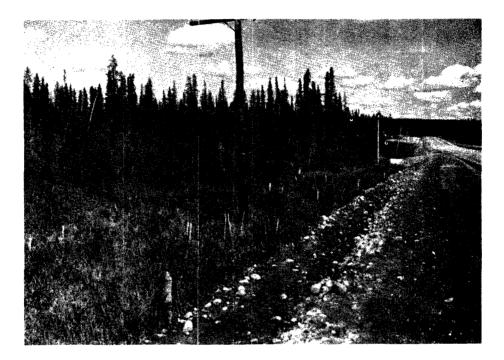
Wetland vegetation should be hand-cleared in winter. Construction equipment should not be used in the right-of-way on either side of the highway. Alaska Highway, km 1097.5.
